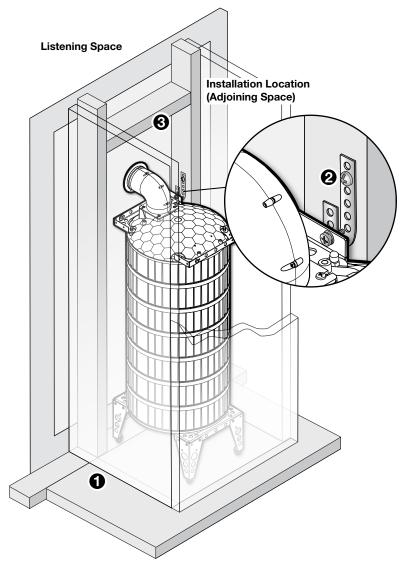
Securing the Floor-mounted Subwoofer and Installing Fire Breaks
